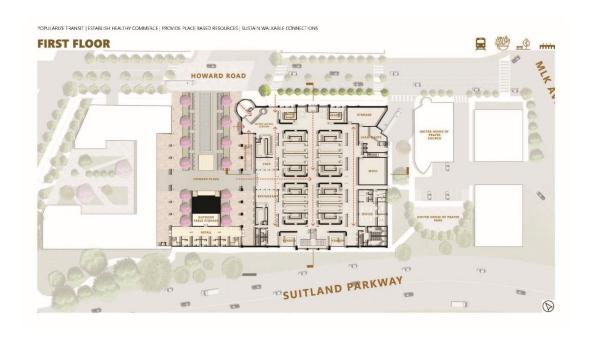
Ground floor plan, showing surrounding Transit Oriented
